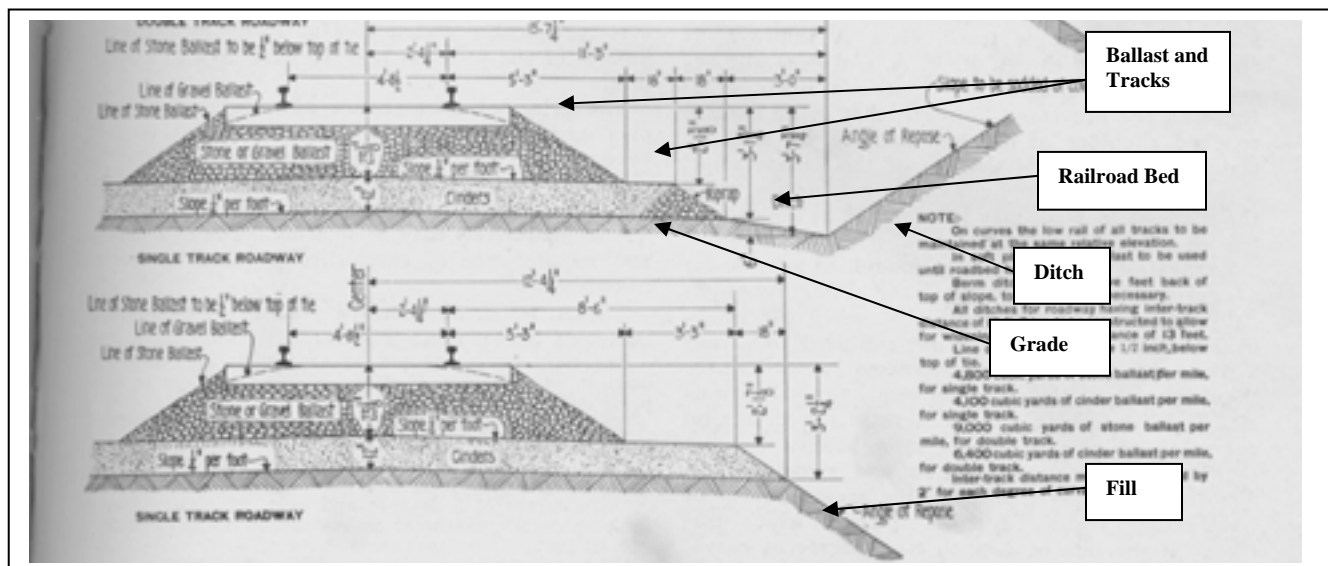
Typical railroad roadway cross section (Howson 1926:95)
